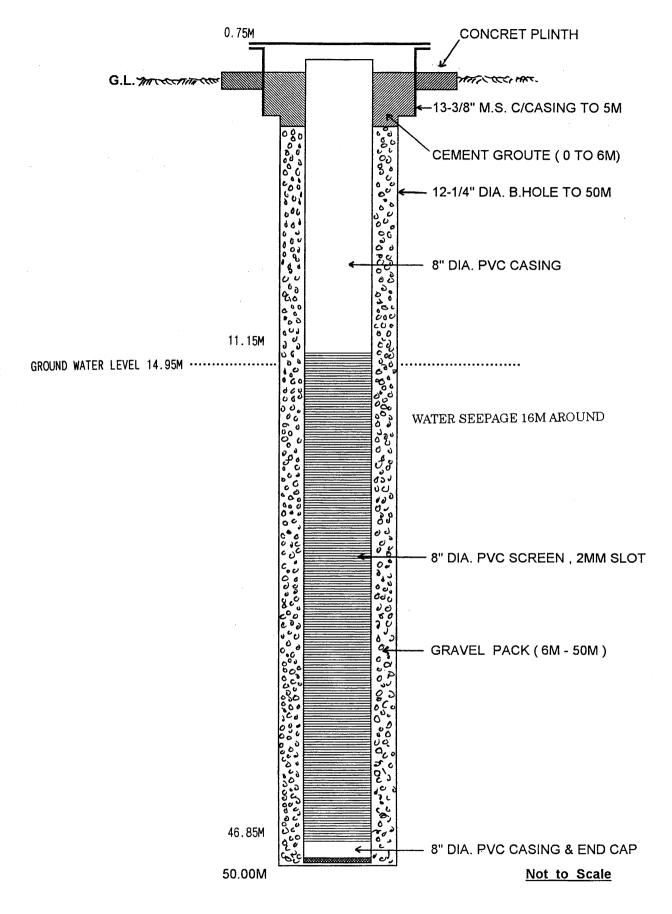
Structure of Bore Well (MJOB-EW-1)
